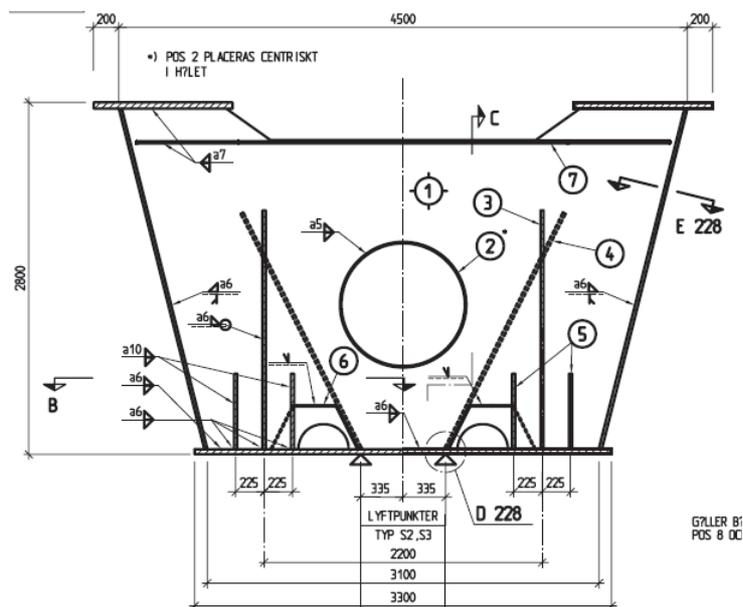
Cross section as well as details over supports for the bridge over Vallundet, Sweden.
